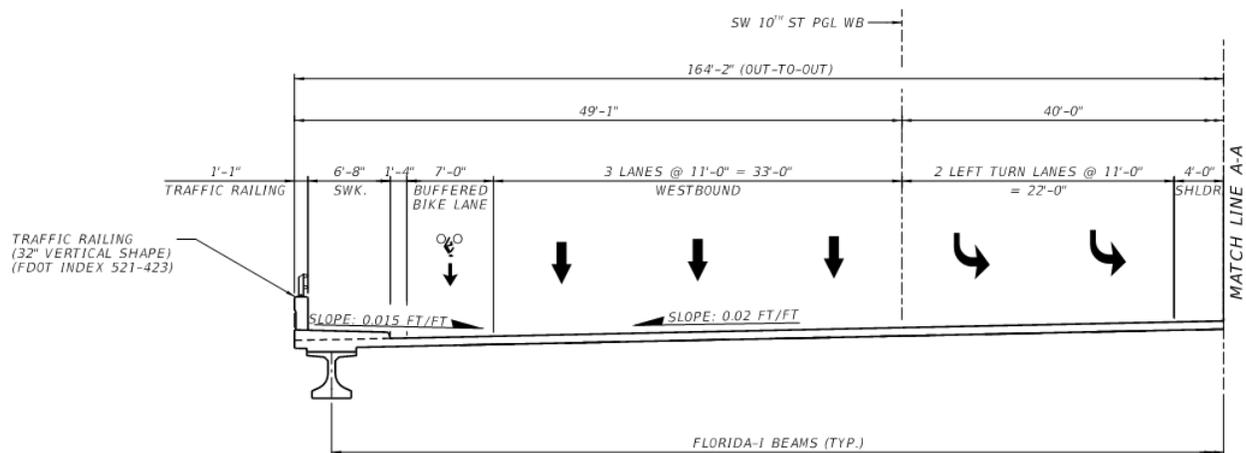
Bridge Typical Section (Bridge No. 12) 1 of 2
